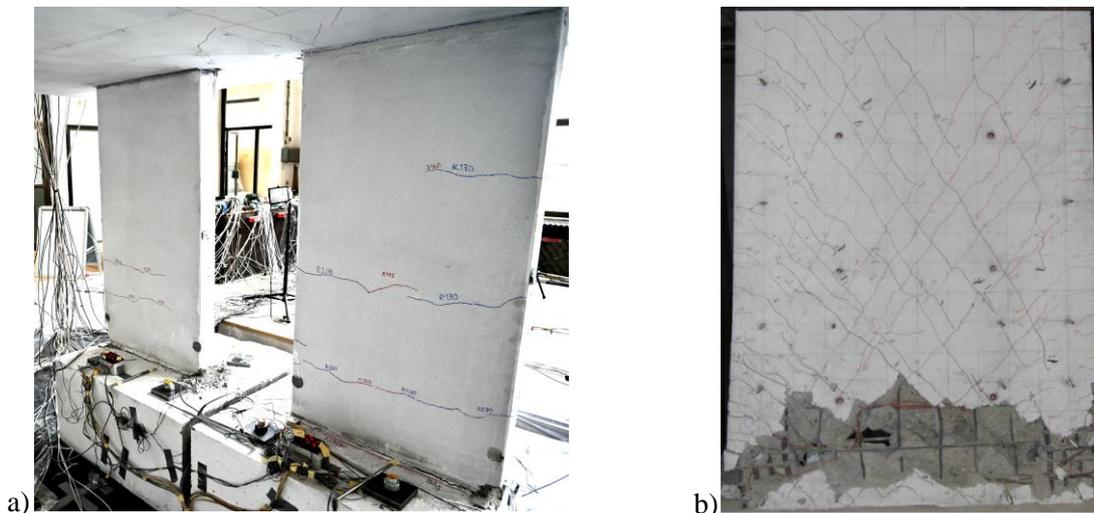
a) Cracks, which were observed in the wall piers,
